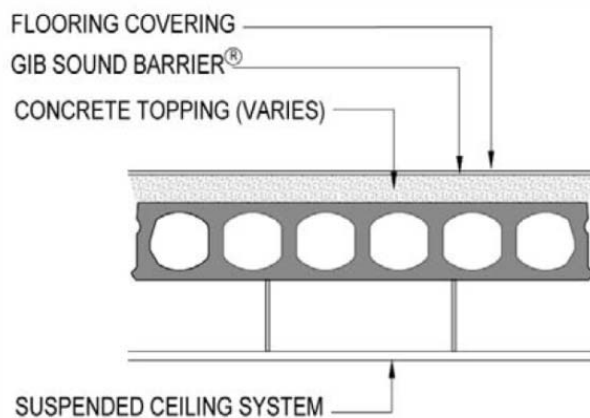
Cross-Section of Hollowcore with Joint Detail
